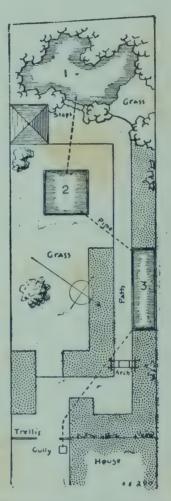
ANOTHER PLAN OF WATER GARDEN.
